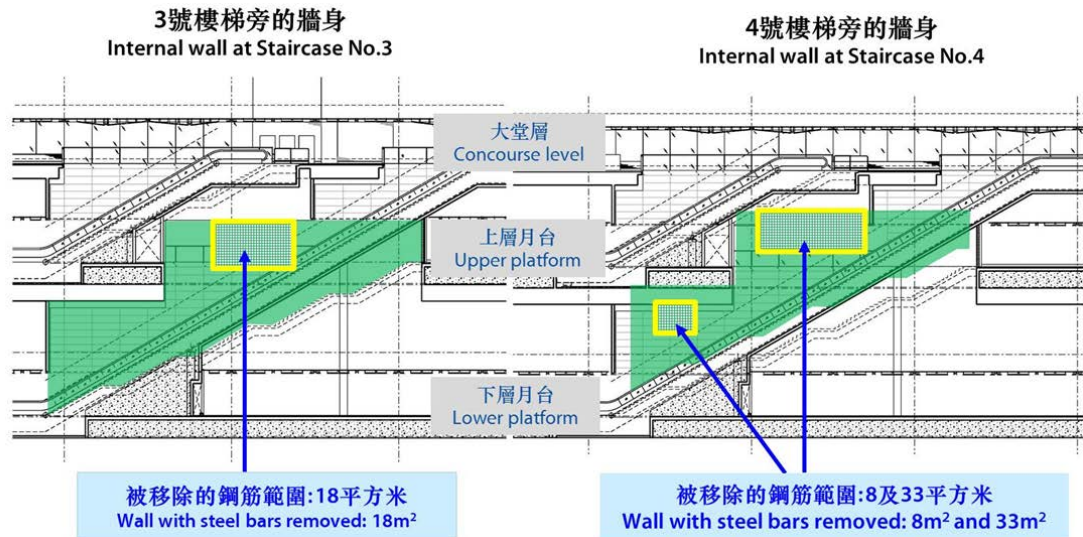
Steel bars removed at three locations on an internal wall of TKW
